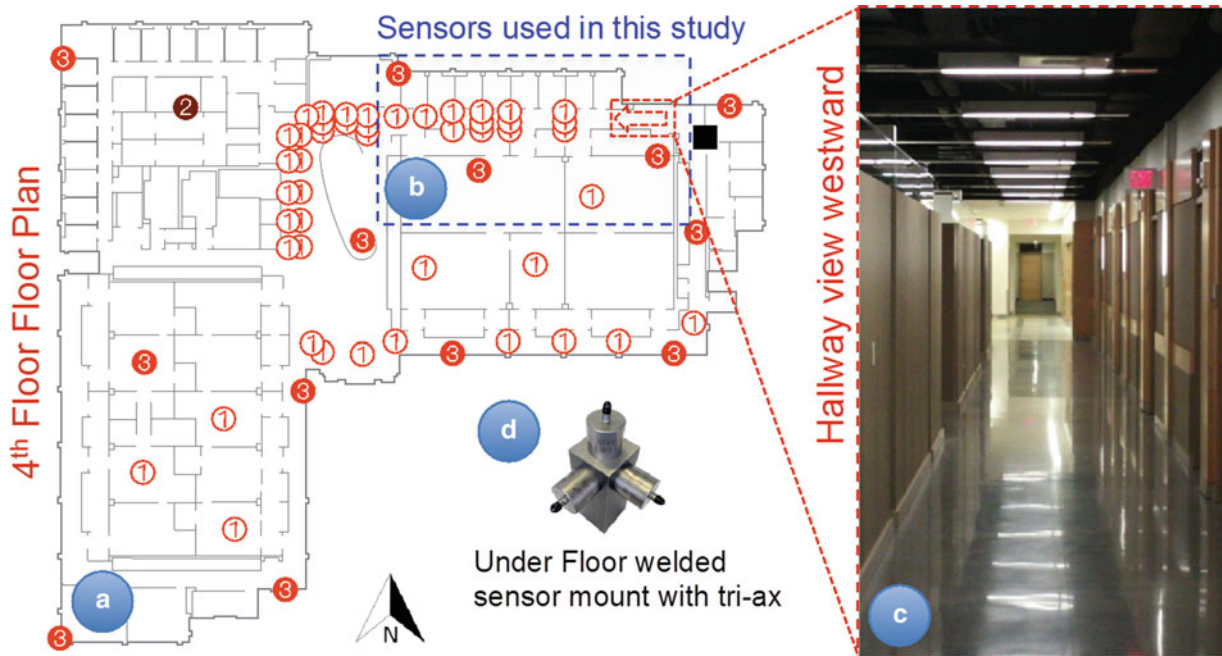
The hallway used for testing: (a) shows a floor plan of the 4th floor depicting the location of the sensors mounted under the floor, (b) the blue shaded area shows the section used in this study, (c) show the view from the east side of the building facing westward, and (d) a picture of a three sensors on a mount is shown *bottom center*. Building north is labeled
